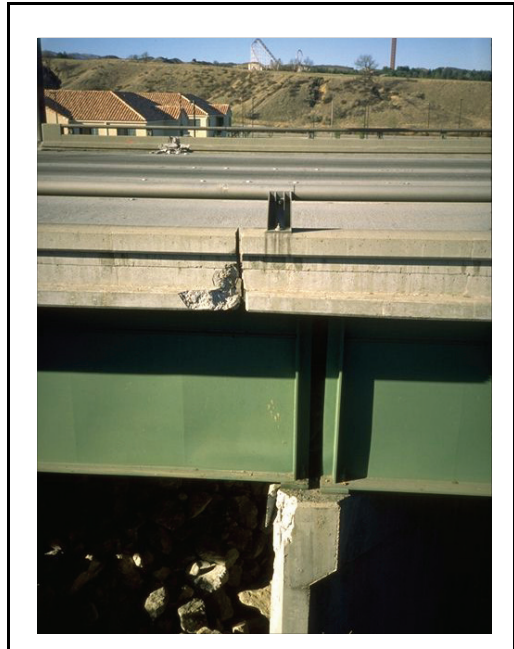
Moderate Damage: Support Damage at Top of Pier. Minor Damage: Fascia Concrete (MCEER)
